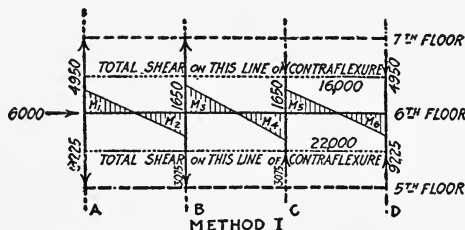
COLUMN SHEARS AND GIRDER MOVEMENTS AT SIXTH FLOOR, CALCULATED BY METHOD I
